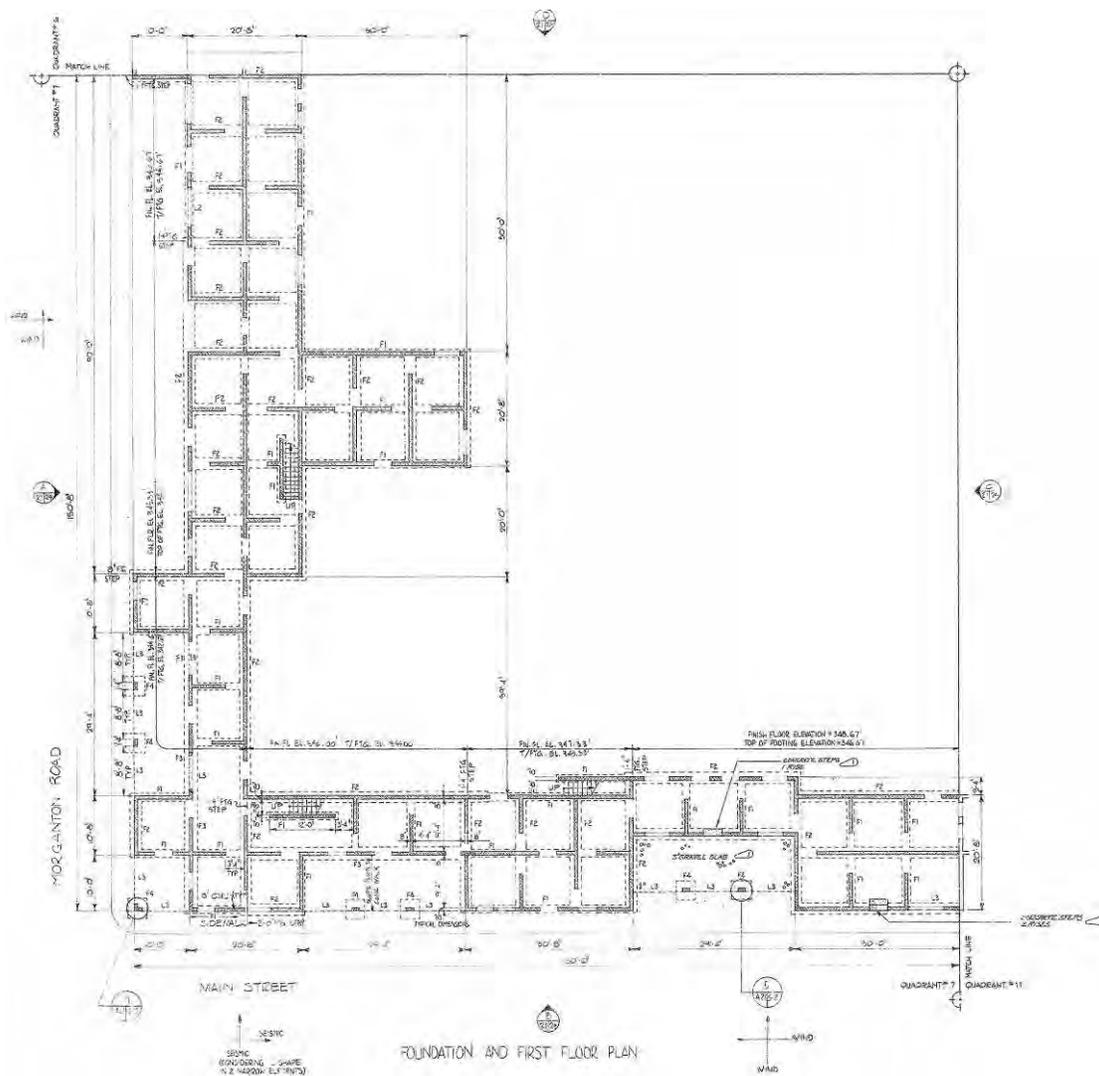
MOUT quadrant 7 buildings foundation and first floor plan, Fort Bragg, NC, 1982 (CON28-09-04 sheet 32 of 55; military operations in urban terrain, foundation and first floor plan, quadrant 7; 24 September 1982).
